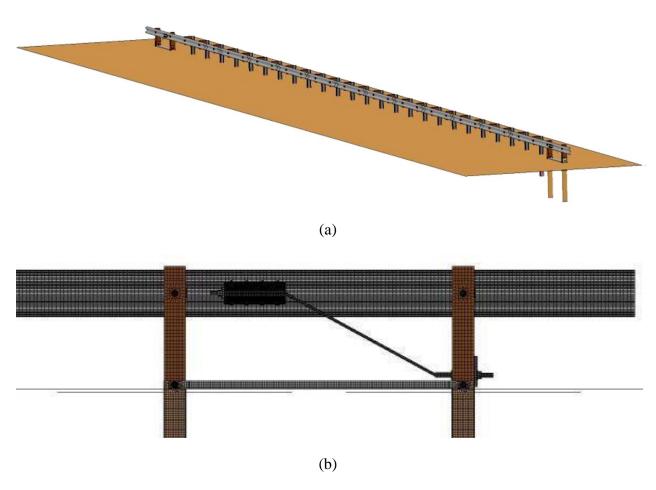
Finite Element Model of MGS: (a) System Layout and (b) End Anchorage
